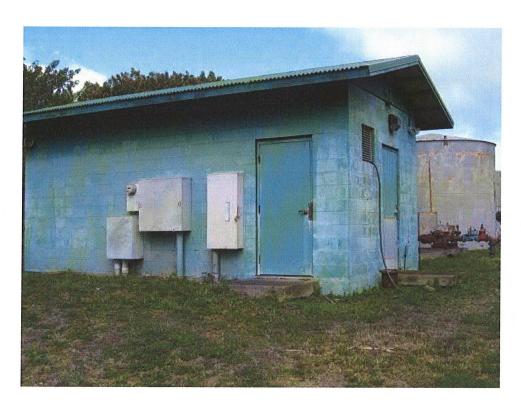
Hamakuapoko Well No. 2 Electrical Building (Makai North View)
